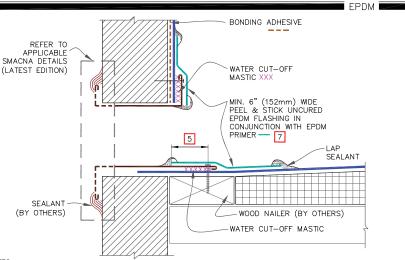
DETAIL UNACCEPTABLE FOR HORIZONTAL APPLICATIONS ON ROOF DECK.
